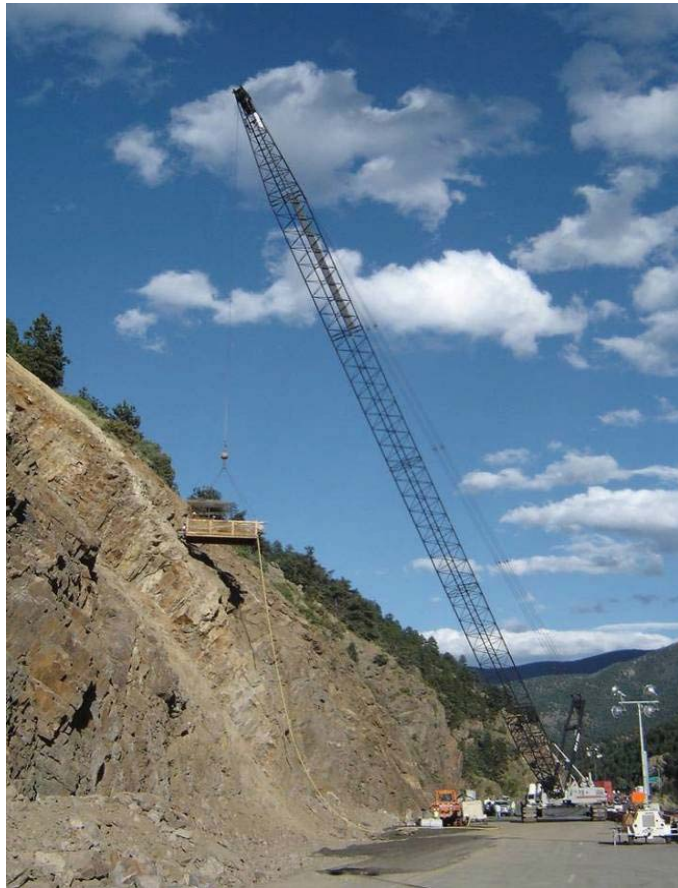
Photo. Installing rock reinforcement using a drill rig suspended from a crane.
